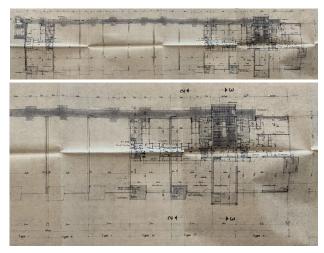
Block VII: Floor +2 - Loadbearing wall distribution
